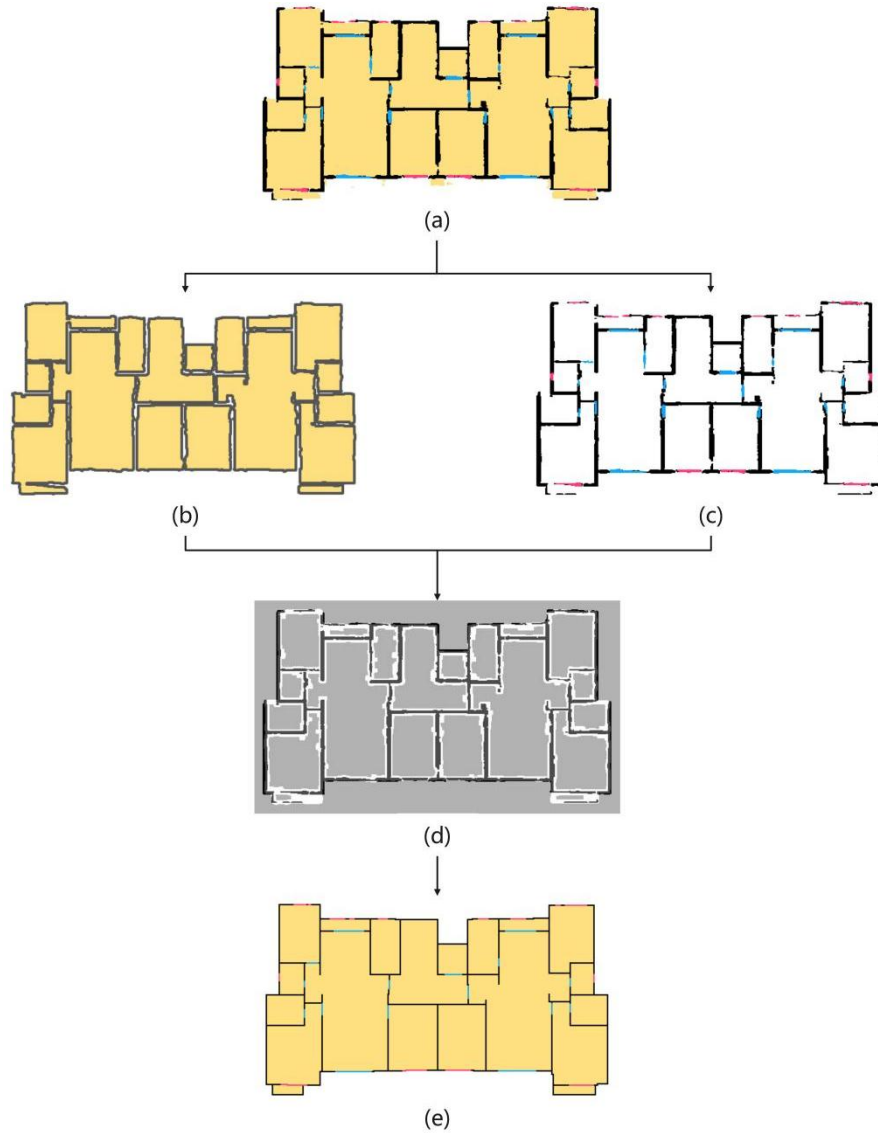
Image processing for floor plan vectorisation (a) segmented floor plan (b) room pixels (c) wall, door and window pixels (d) iterative room boundary dilation (e) vectorised floor plan
